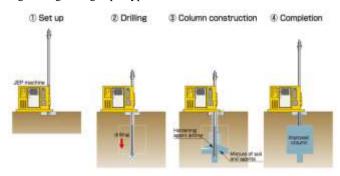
A typical sequence of Jet Grouting Work (Raito, 2019)
